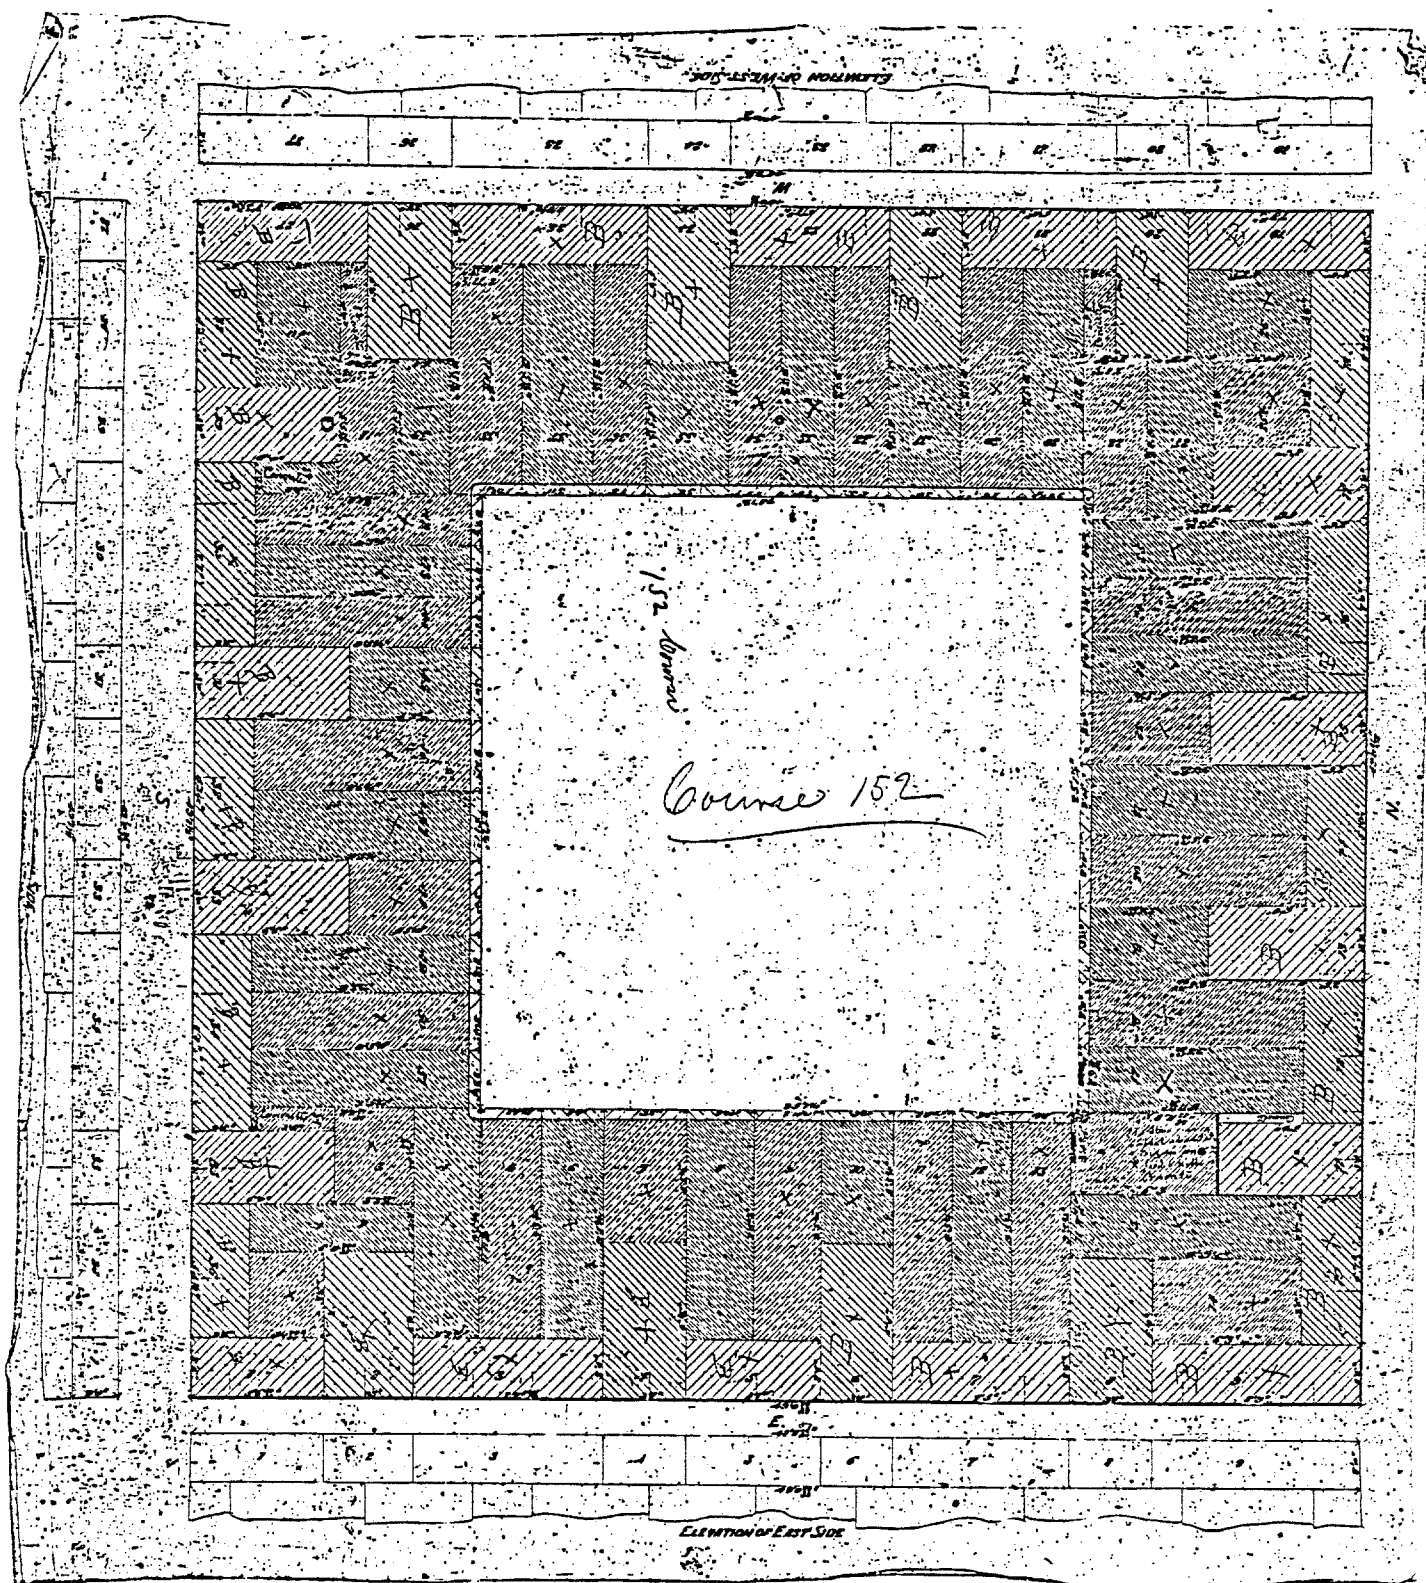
152' level plan of masonry. Working drawing with dimensions of each stone. Shading patterns indicate marble on the exterior, a granite veneer on the interior and granite blocks between. National Archives, Record Group 79, file 78-8. Original scale $1/2" = 1'-0"$, reduced to approximately $1/8" = 1'-0"$.
